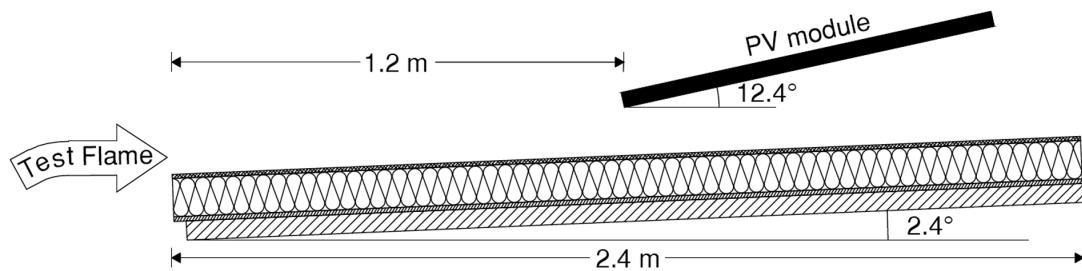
Sketch of roof construction and PV module in scale for the spread of flame test for low sloped roof constructions. Notice that the upper layer of the roof construction (roofing membrane) is not in scale as the minimum thickness is 1.5 mm. Based on Figure 15.5 in UL 2703 [77] and Figure 4.9 in UL 790
